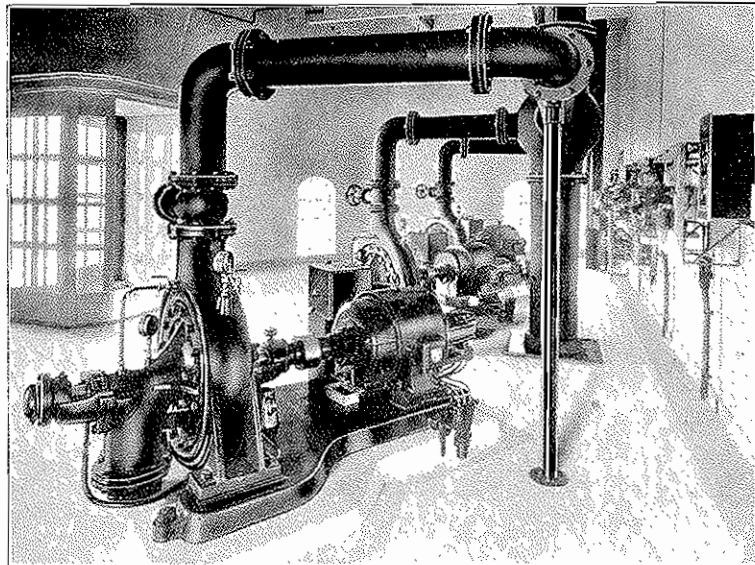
Pumping station consisting of 3 electric driven pumps with automatic starting gear.
